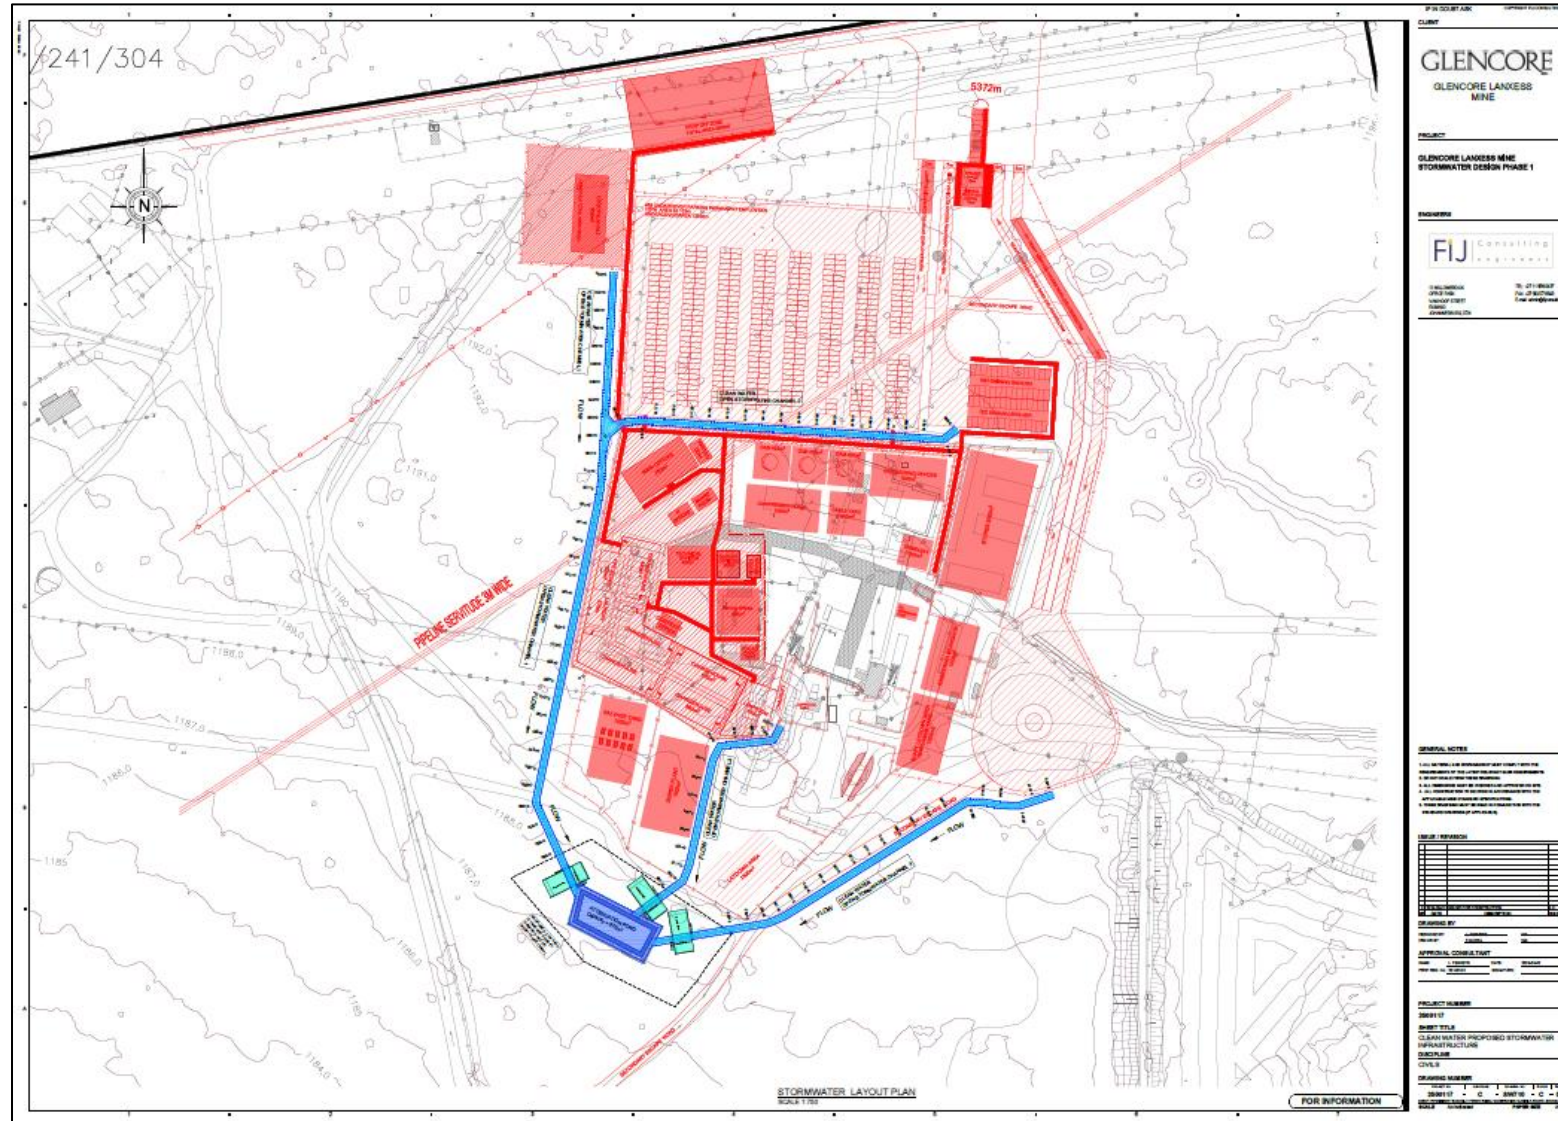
Detailed layout for the proposed project (EIMS BID, 2024)
